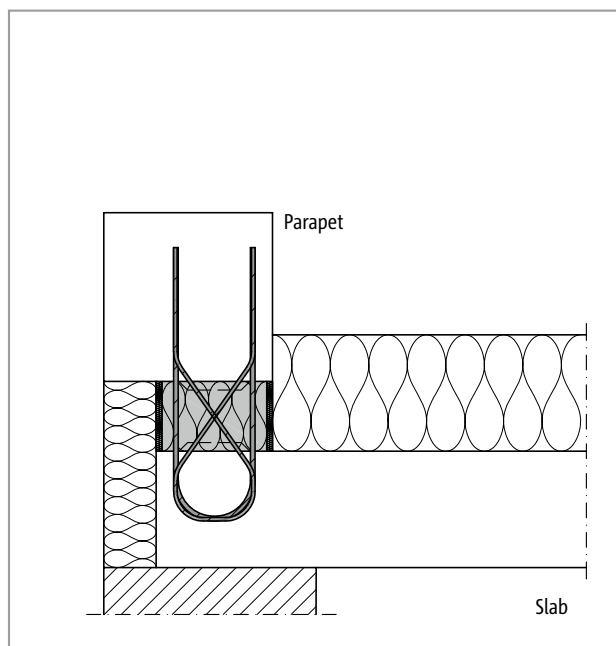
Schöck Isokorb® XT type A: Connection of a parapet (XT type A-MM1)
